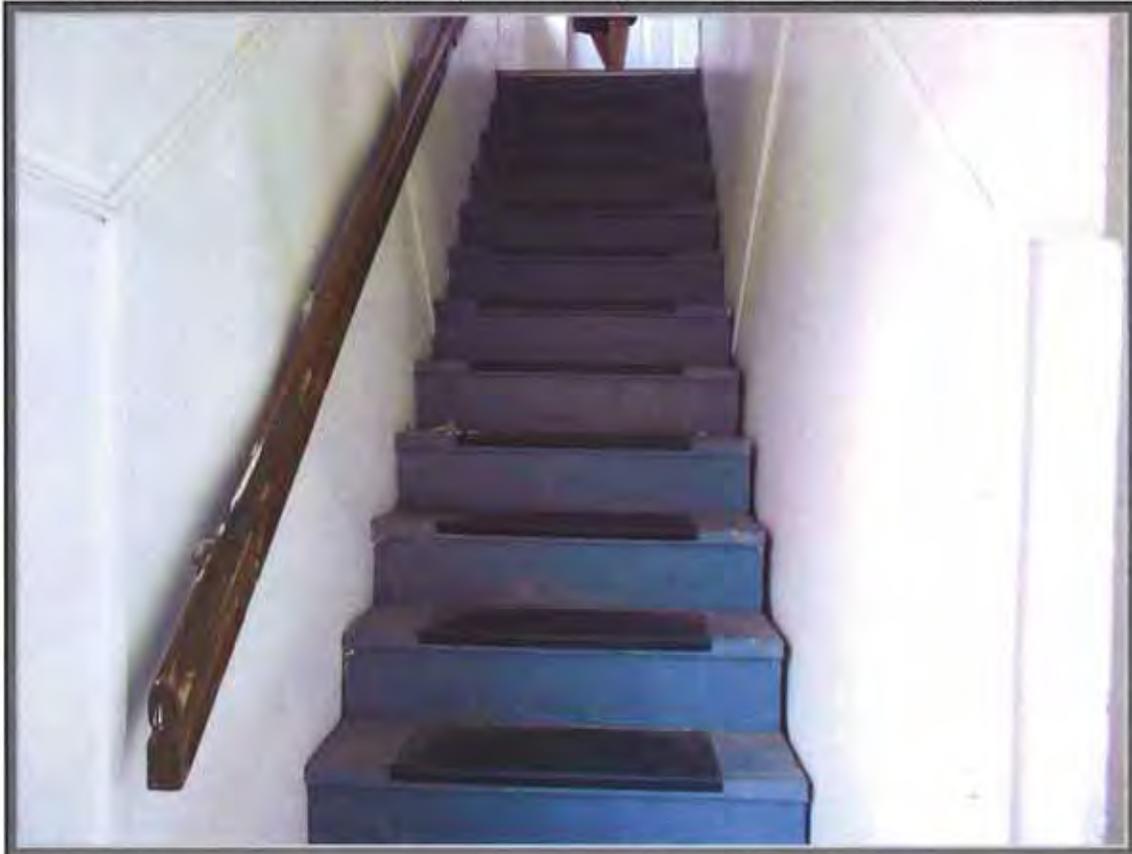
Damage from settlement of structural elements where ineffective structural modifications were made.
